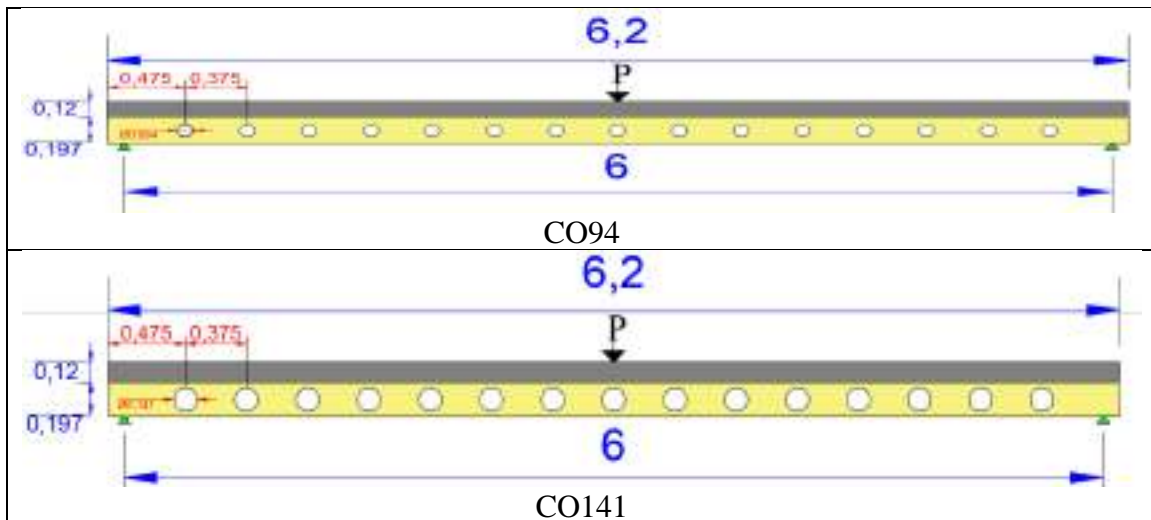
Geometry and dimensions of the curved composite steel–concrete beam with opening (unit: m).
